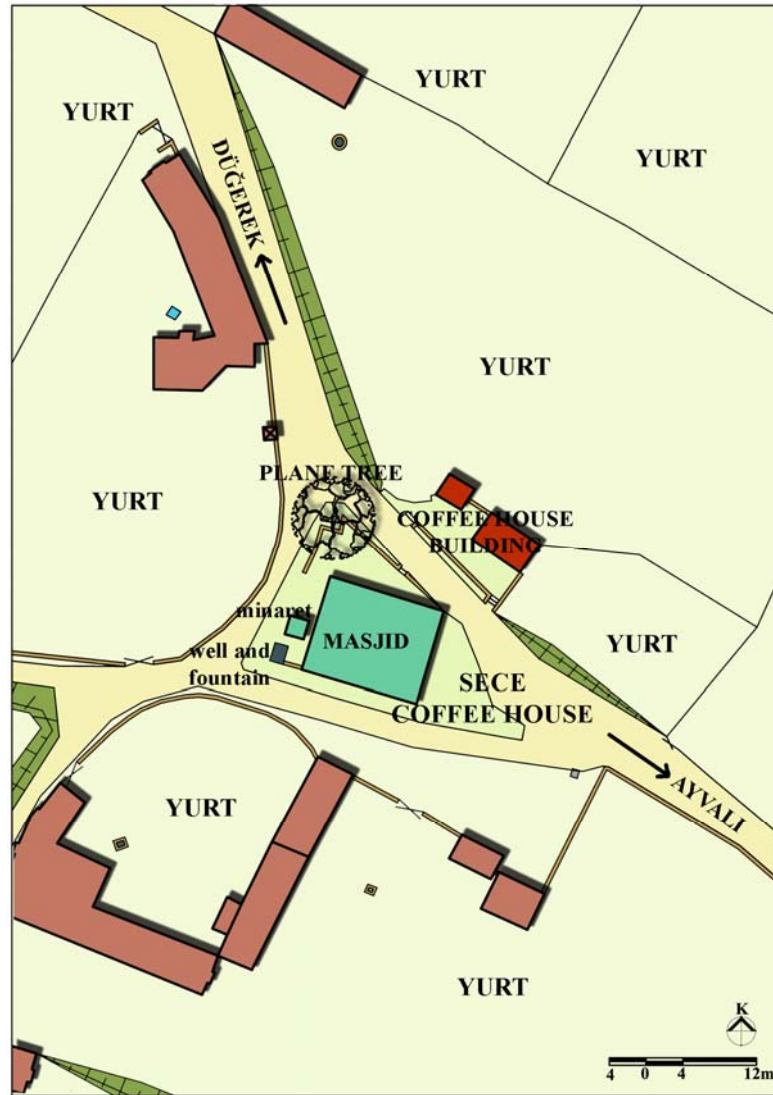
Sece Coffee House Plan (Source: Drawn by Feray Koca)
